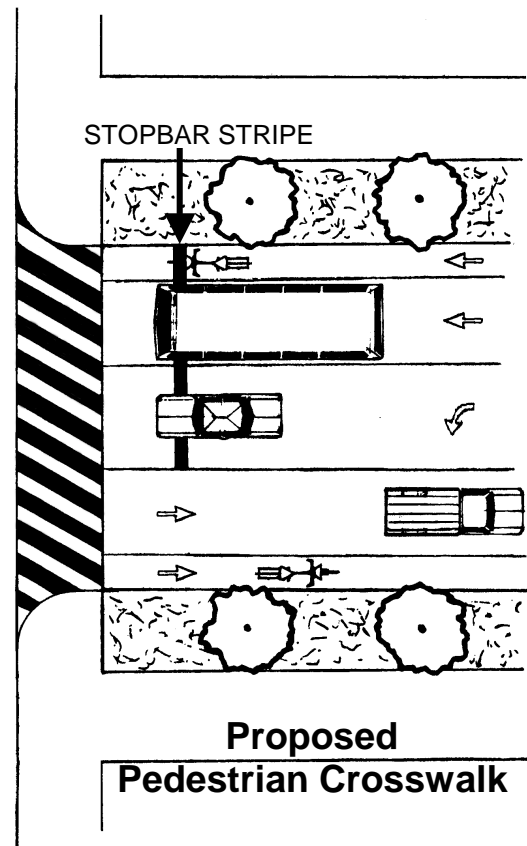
19 Proposed plan view of crosswalk and stopbar stripe.
